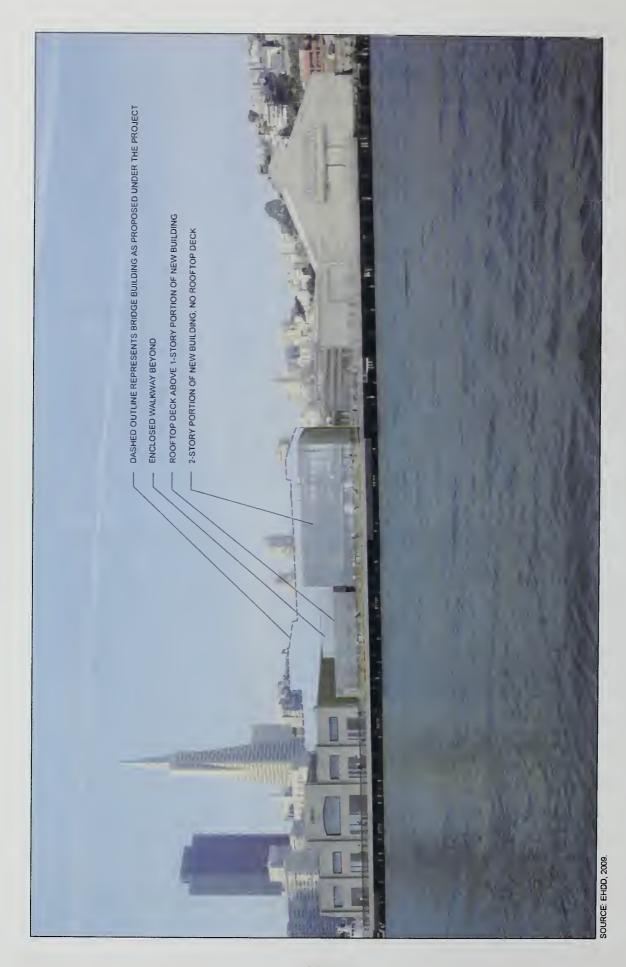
(NEW DEIR FIGURE III.C-10) BRIDGE BUILDING VARIANT - COMPARISON RENDERING OF BRIDGE BUILDING VARIANT AND PROJECT BRIDGE BUILDING THE EXPLORATORIUM RELOCATION PROJECT
